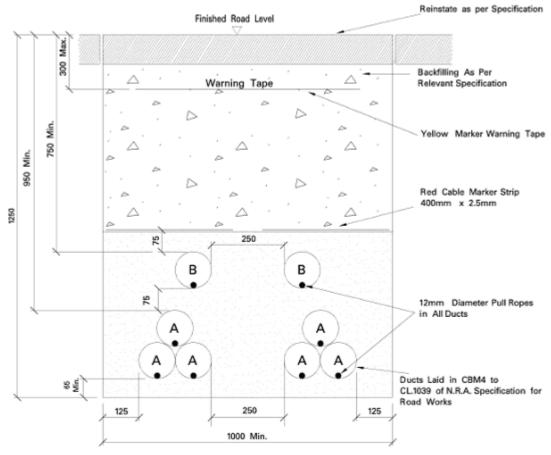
Typical cross section for 110 kV duct installation for two circuits
